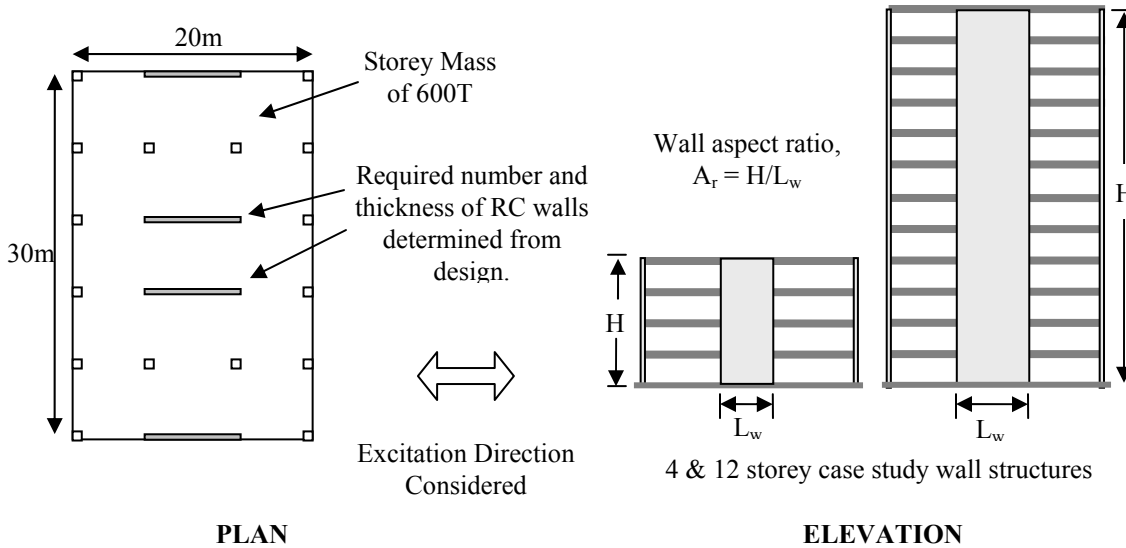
Plan and elevation of case study wall systems examined in this work (Sullivan, 2010).
